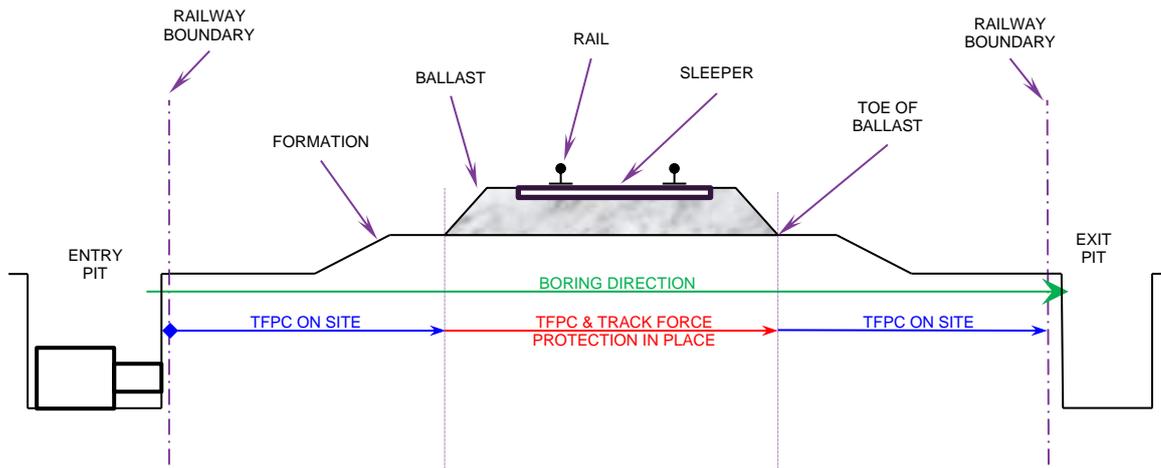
Schematic showing when to use Track Force Protection during Pipe Jacking or Microtunnelling
